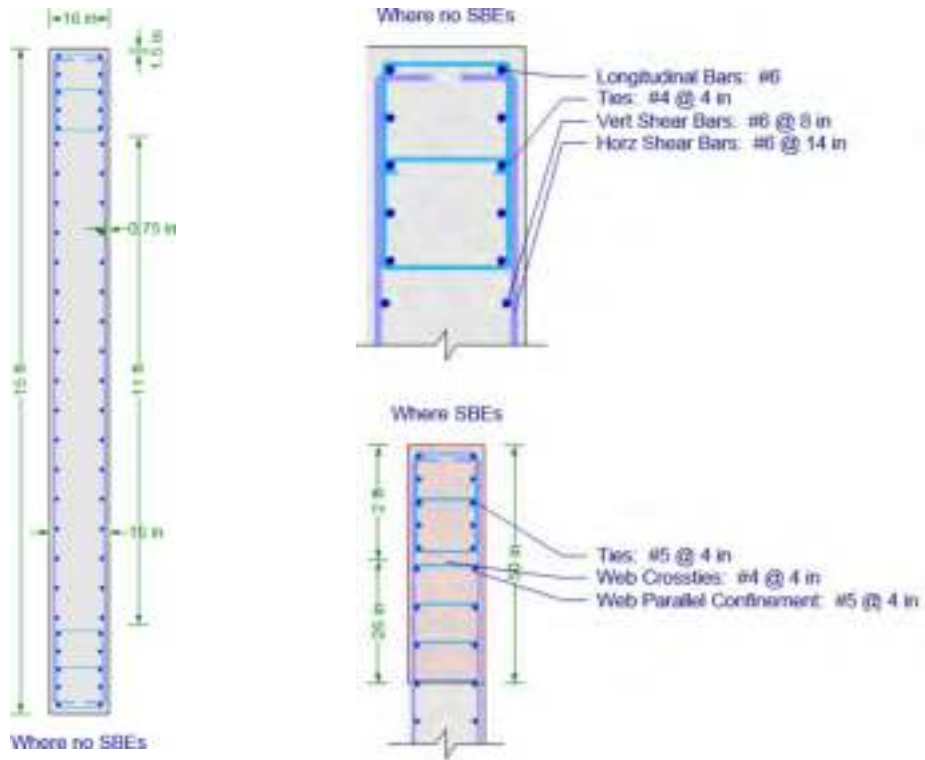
Building (B11-12S-L-S) Special RC Shear Reinforcement Details; Wall Section for Floors 1-3
